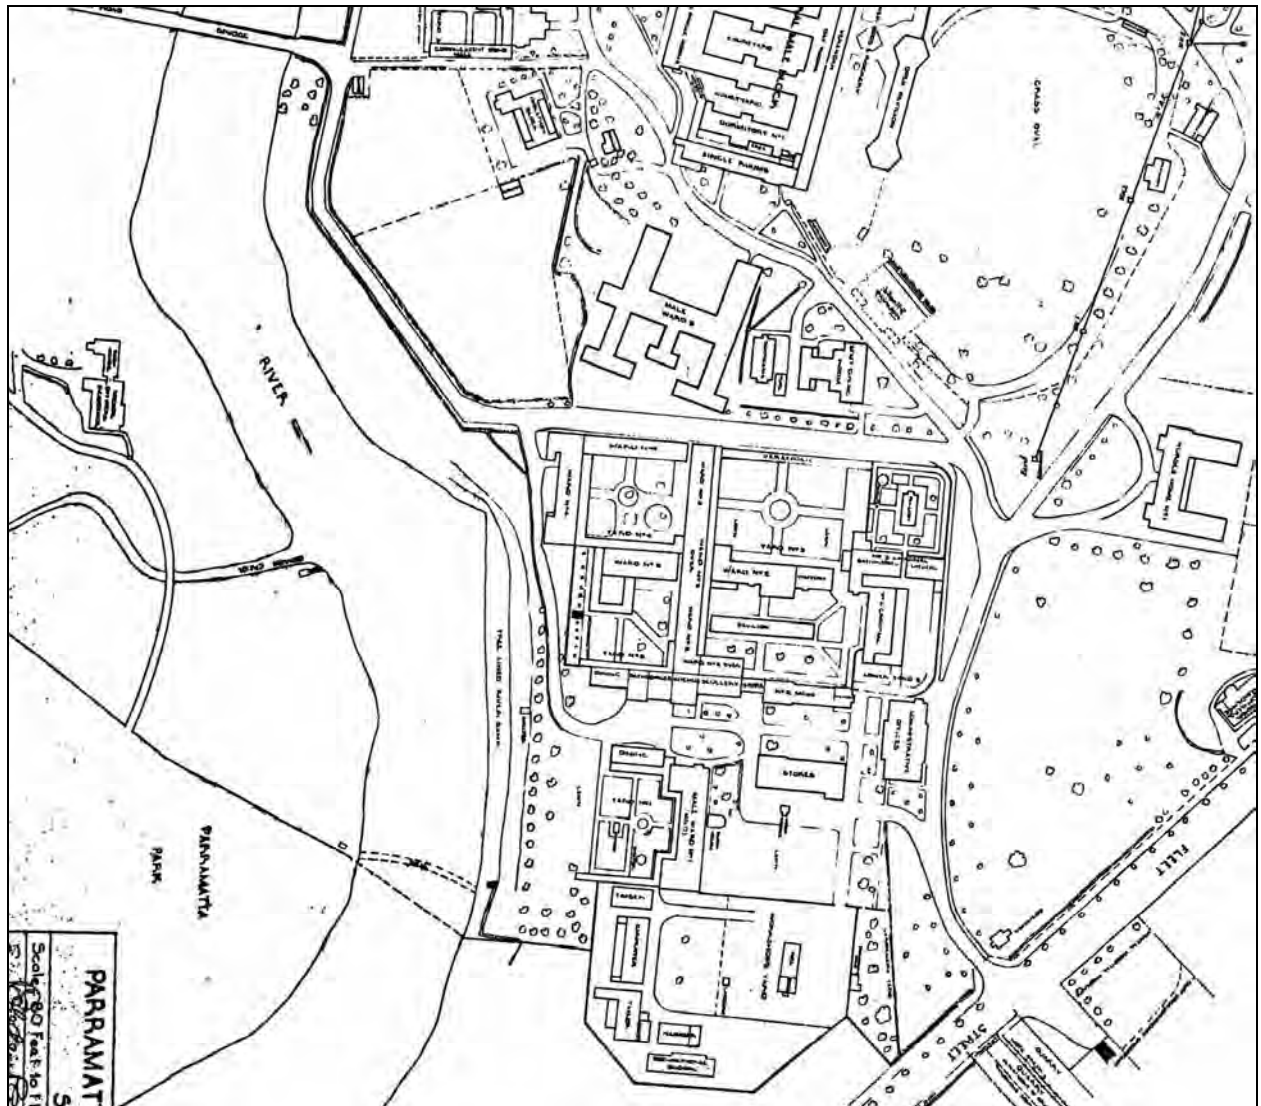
Site plan of 1949. Source: MH9/165, PWD Plans Room
